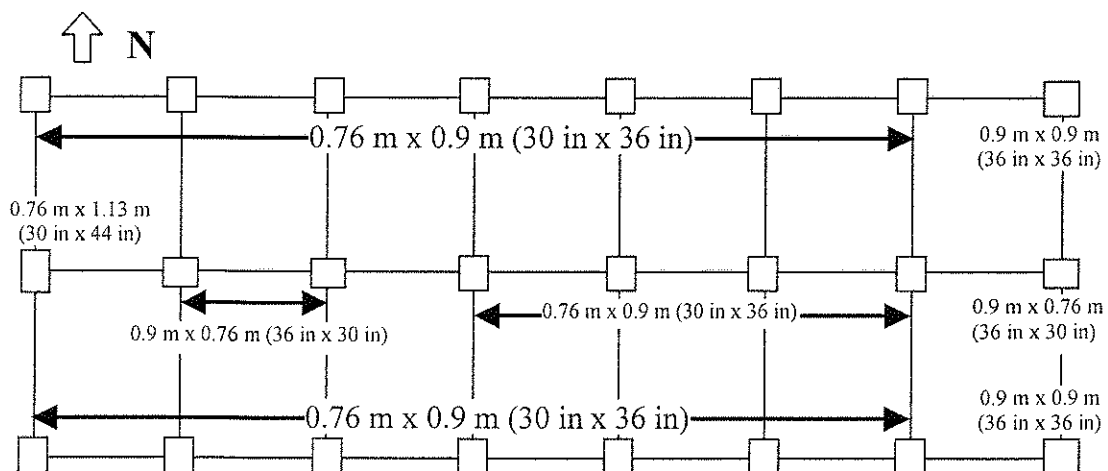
Column Distribution on Ground Level and 1st Sublevel
